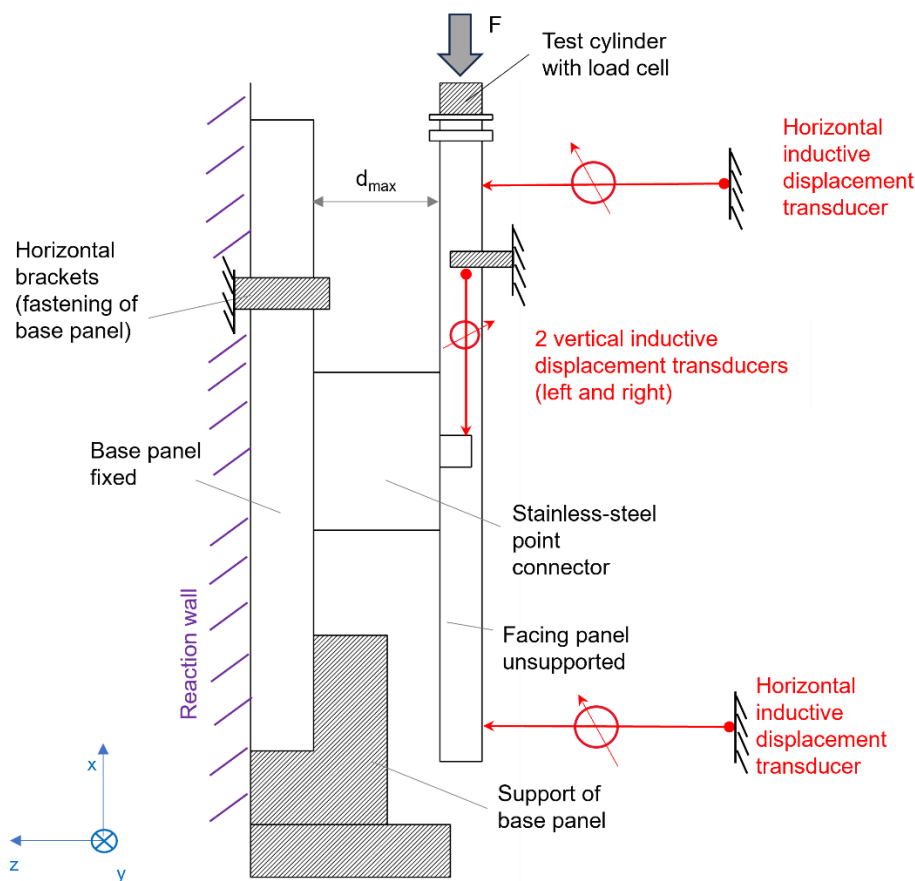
Test rig – Static shear test in x-direction
